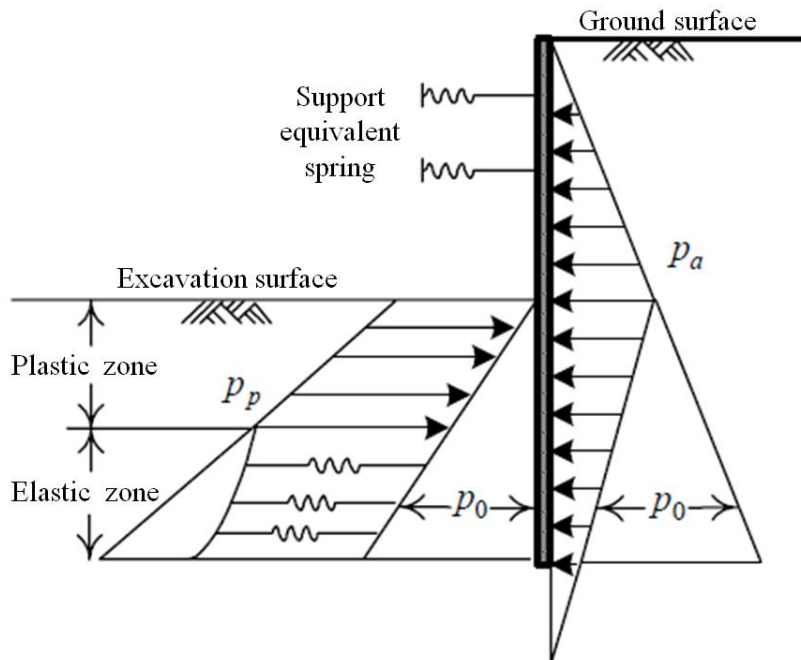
demonstrates another analysis mode for elastic foundation beams, where the lateral support system of the retaining walls after excavation is replaced by equivalent springs in the simulation, and the lateral support system from soil under the excavation surface is simulated by series of springs. Lateral pressure exerting on the retaining walls, when above excavation surface, is considered active earth pressure, when it is below the excavation surface, it is considered the pressure difference between the active earth pressure and passive earth pressure.
